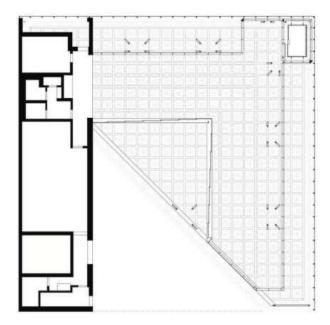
Plan view of the top floor showing the multiple rood structure supports ¹⁴⁷
